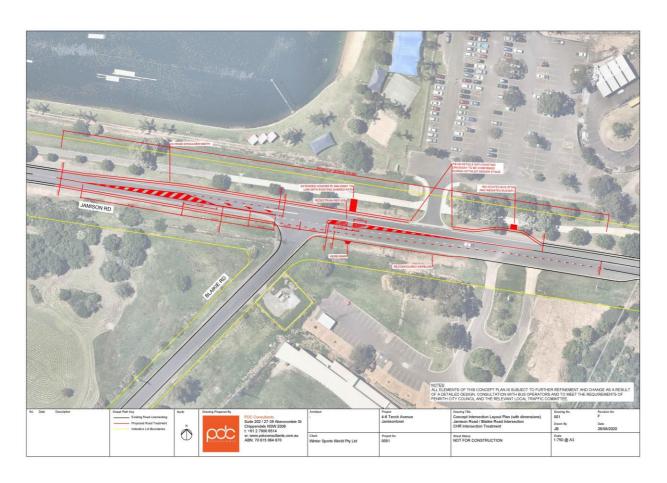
Upgraded layout of the Jamison Road and Blaike Road intersection with the CHR treatment
